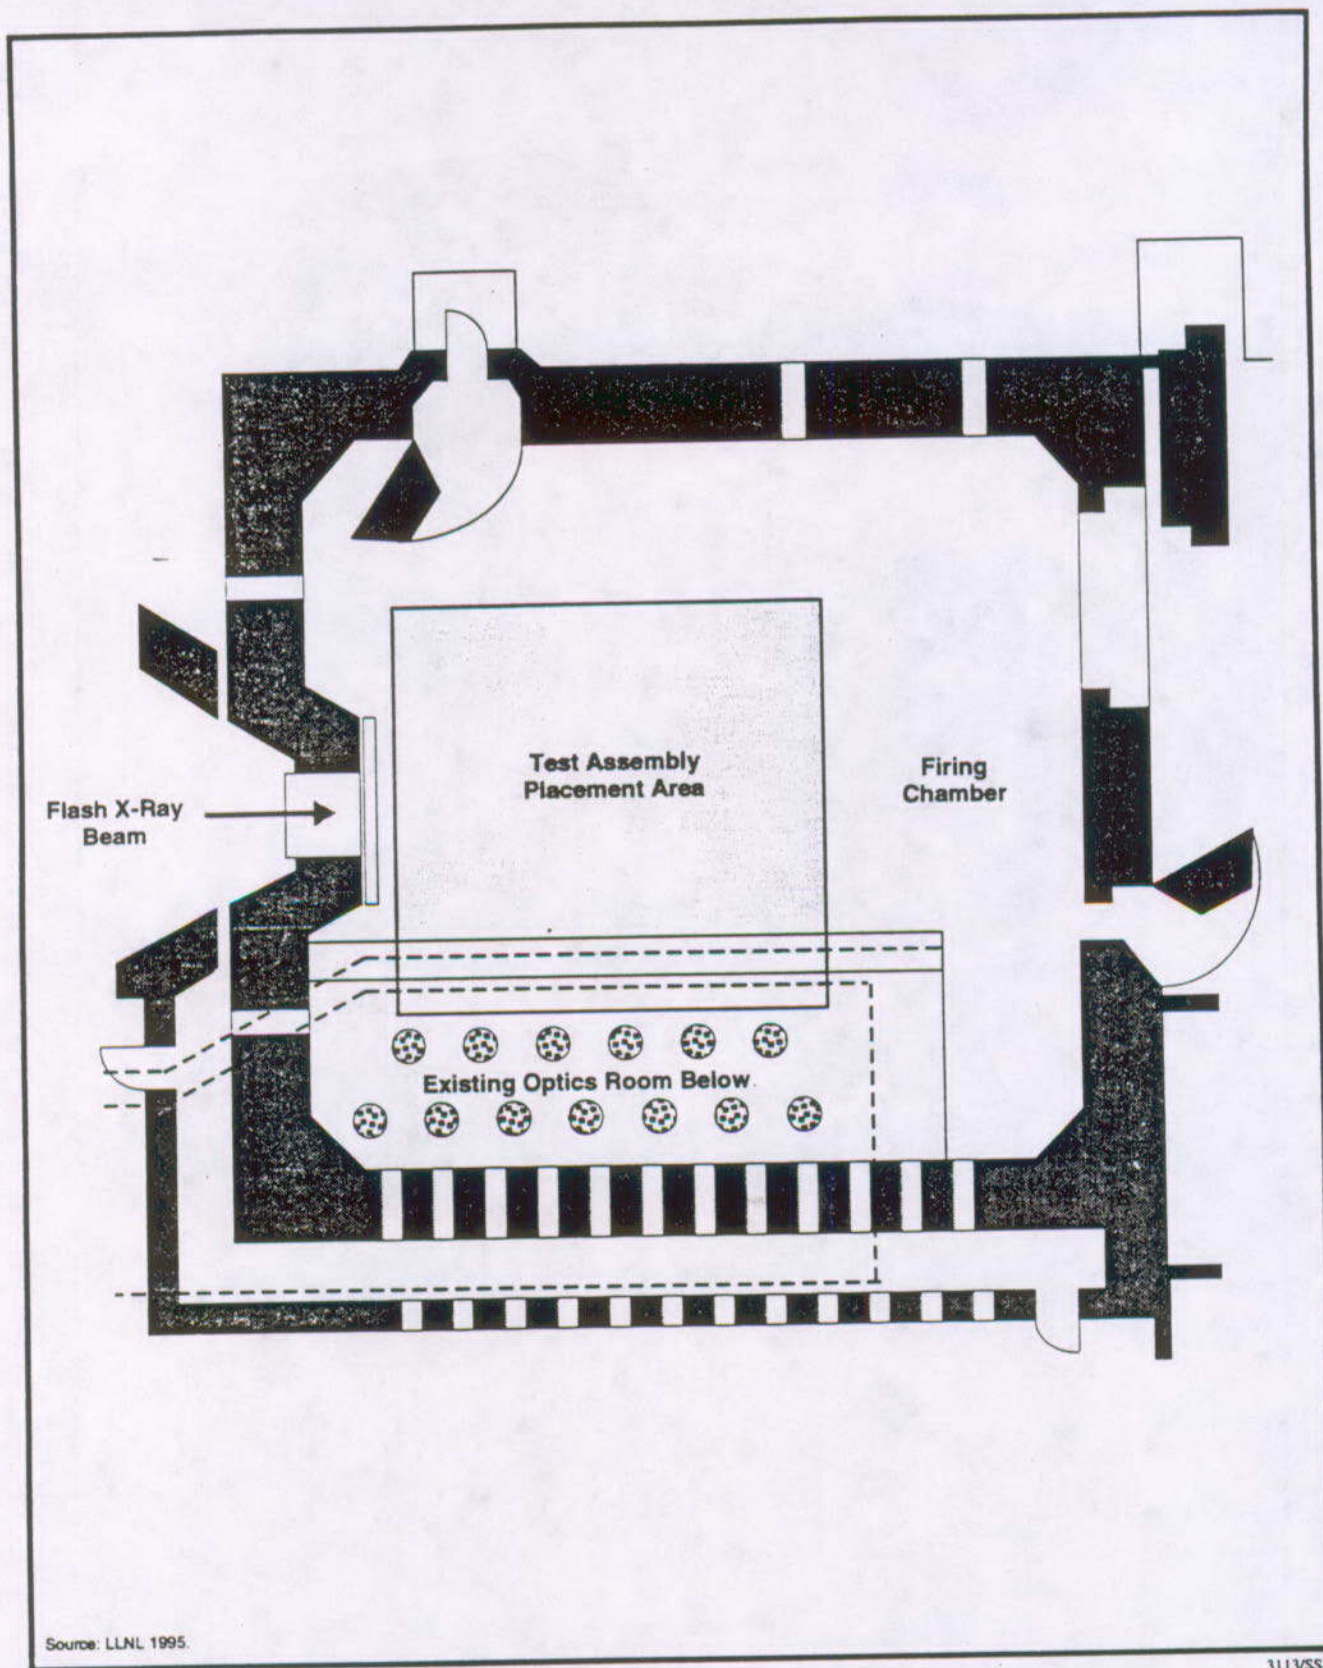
Firing Chamber Portion of the Contained Firing Facility in Building 801.
